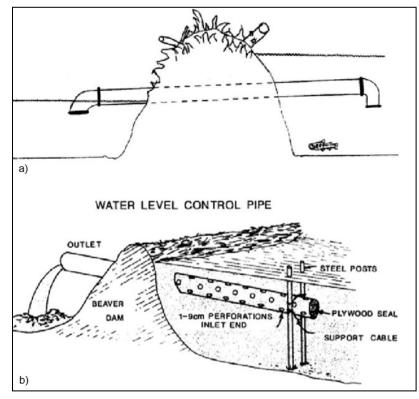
Examples of pond levelling structures: a) beaver siphon and b) perforated culvert. Constructed ditch factsheet. 2005. Drainage Management Guide – No. 16. British Columbia Ministry of Agriculture, Food and Fisheries. p.2.
